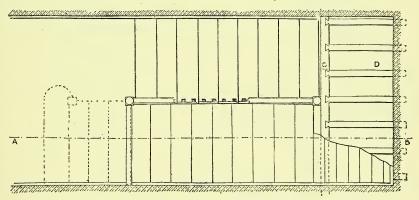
Plan of Dog-legged Staircase 3 Ft. 6 In. wide.
